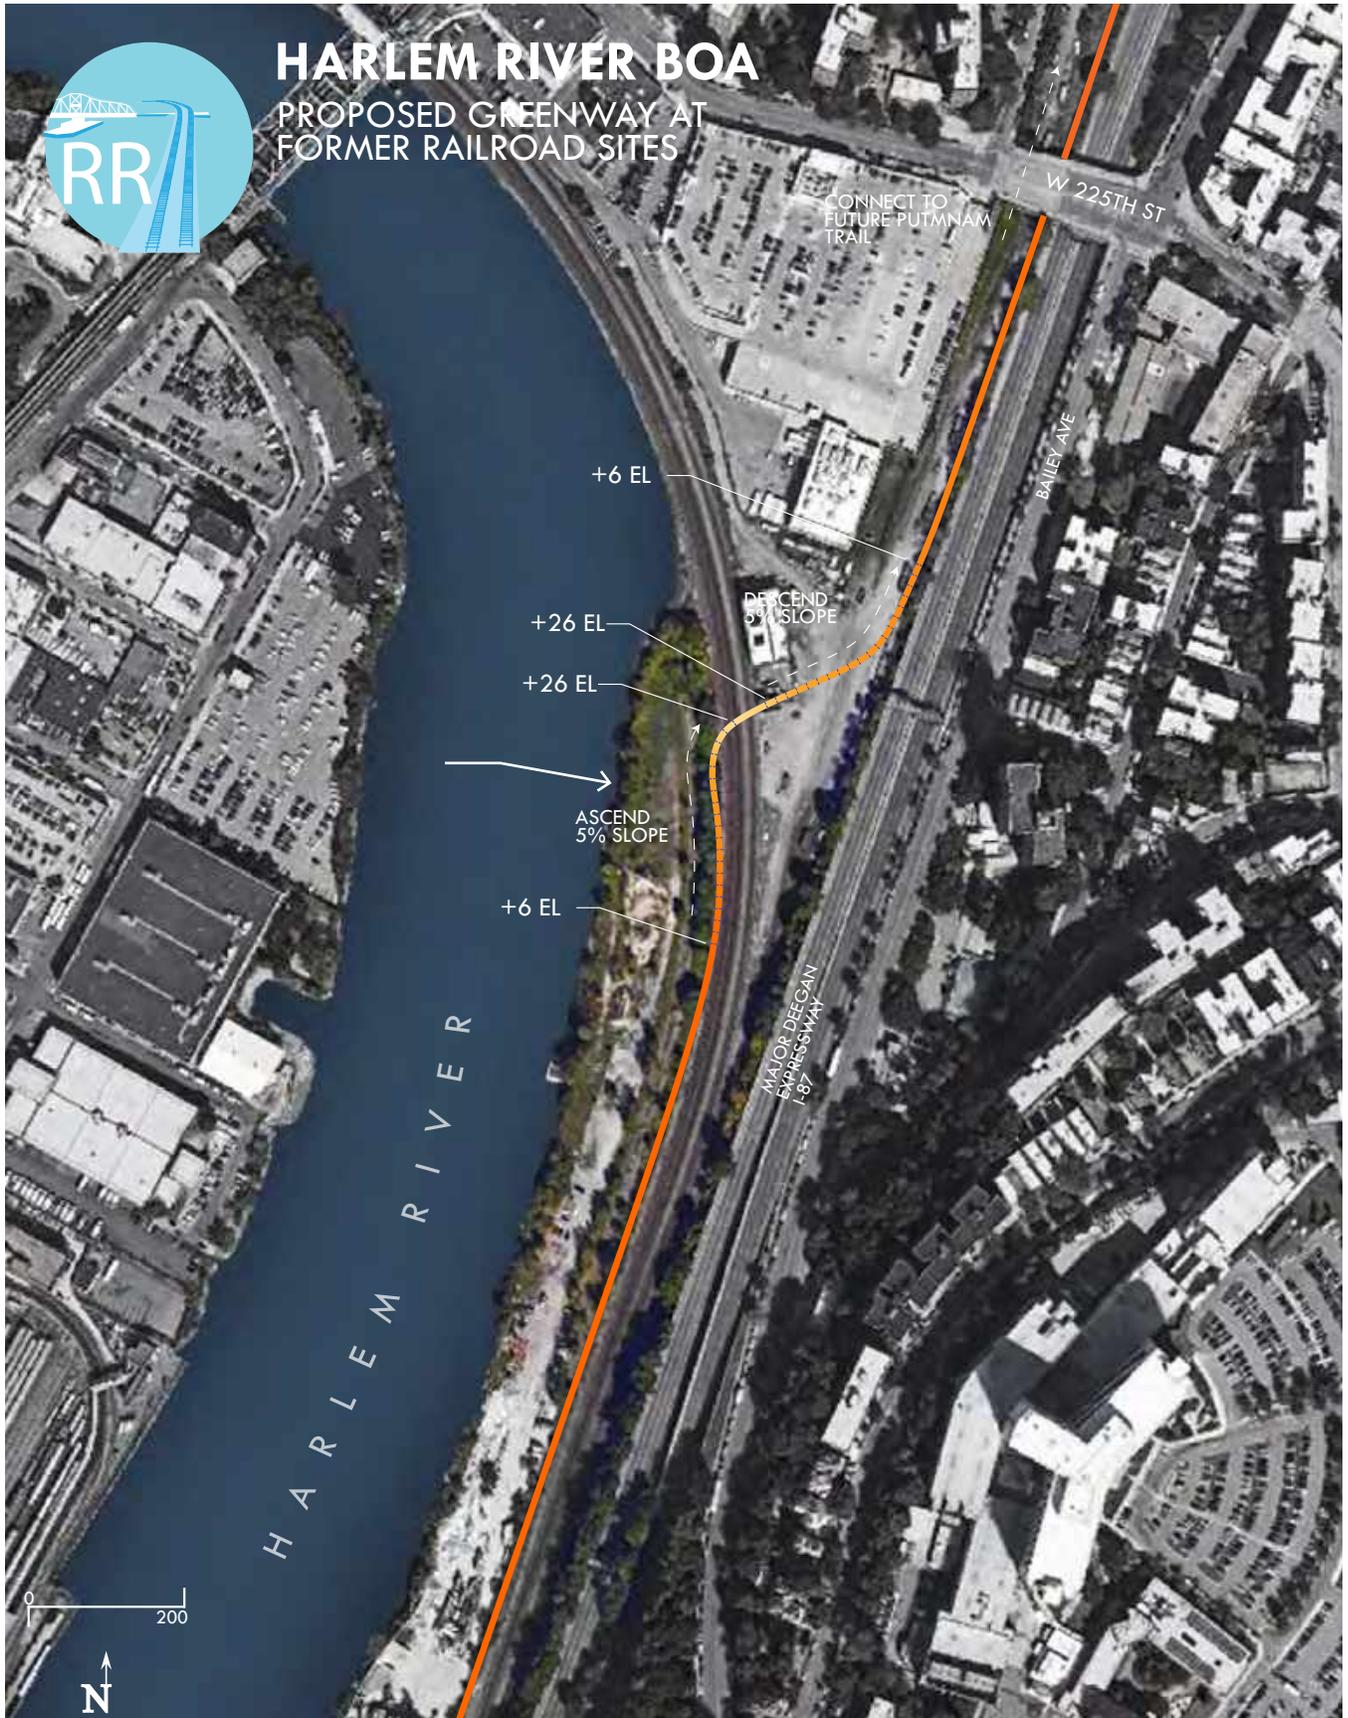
Concept Plan: Proposed Greenway Connection at Former Railroad Sites
